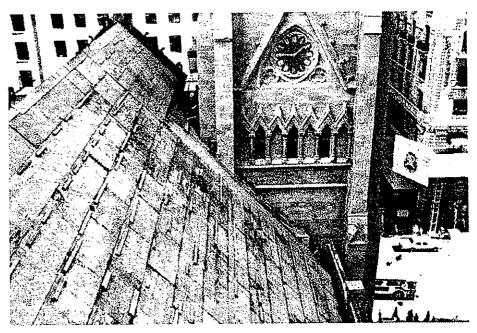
Dropped equipment, tools, and materials all present risks when new construction rises above neighboring historic structures. In this case, the historic state roof was completely covered with sheets of exterior grade plywood. Photo: National Park Service files.
